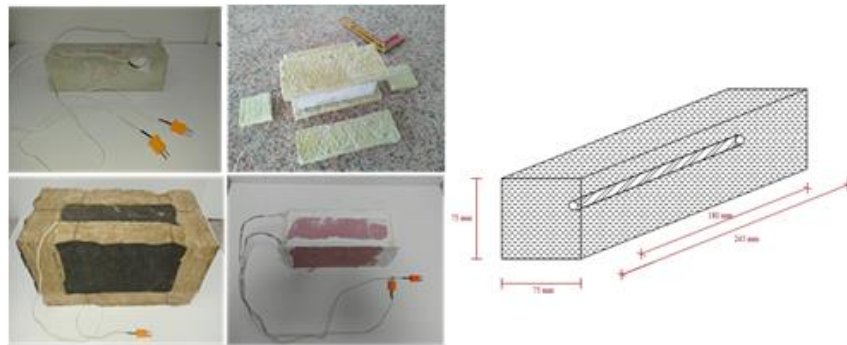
Figure A. Protection of FRP reinforced concrete specimens with different insulation materials
